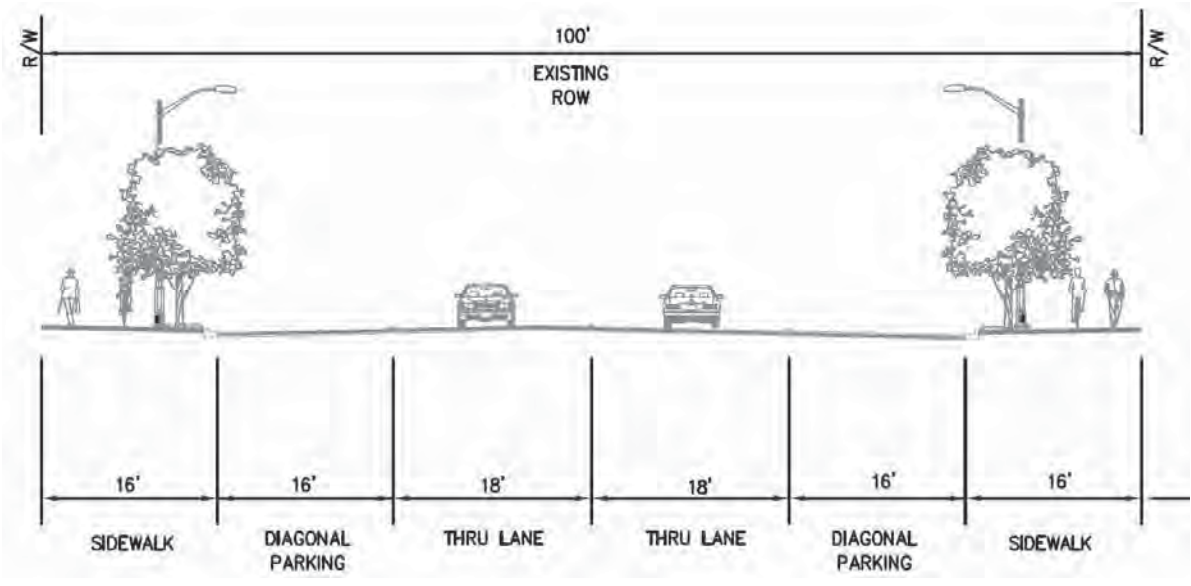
Proposed Cross Section, 3rd Avenue With Diagonal Parking
